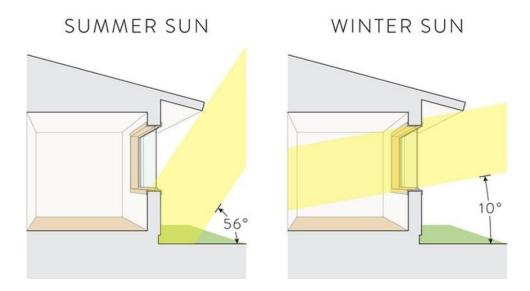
Overhangs shading the building from high summer sun Source: (Tin – Tai, 2017)
